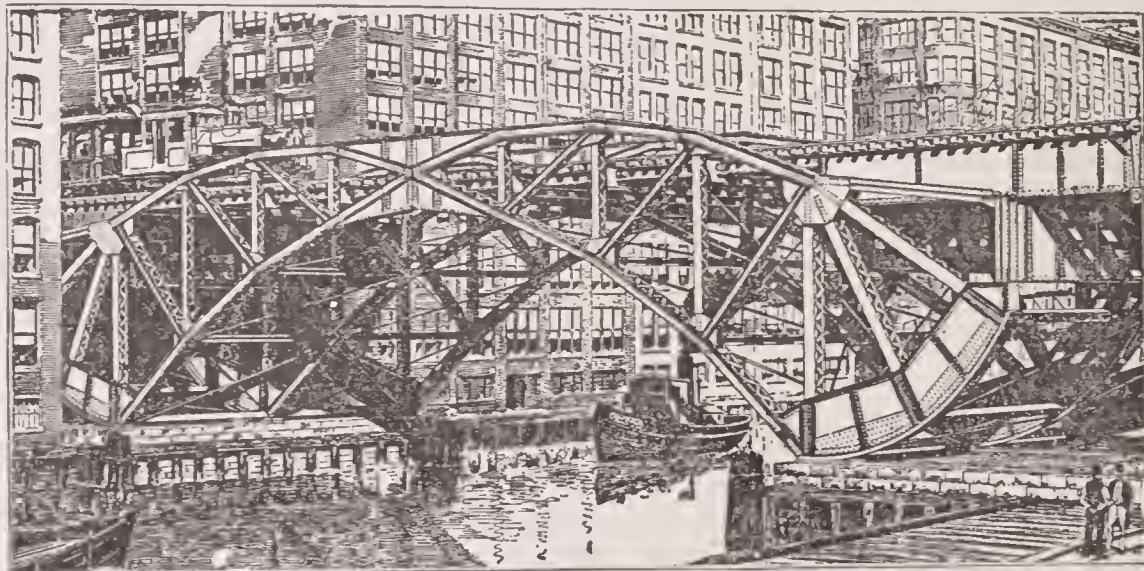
BASCULE BRIDGE, FOR ELEVATED RAILROAD, VAN BUREN STREET, CHICAGO.
